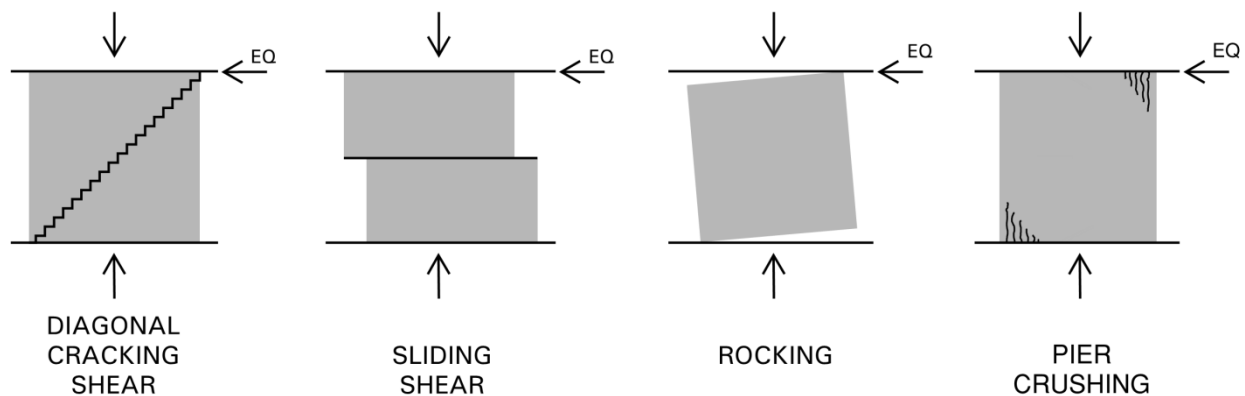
Masonry Pier Potential Modes of Failure
